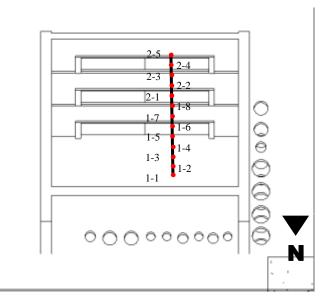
TC inside elevator shaft from 5th to 3rd floor
